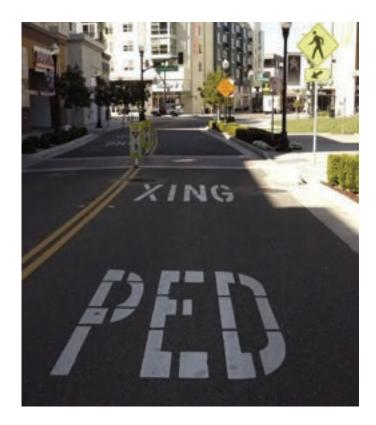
Pedestrian Crossing Ahead Pavement Marking
